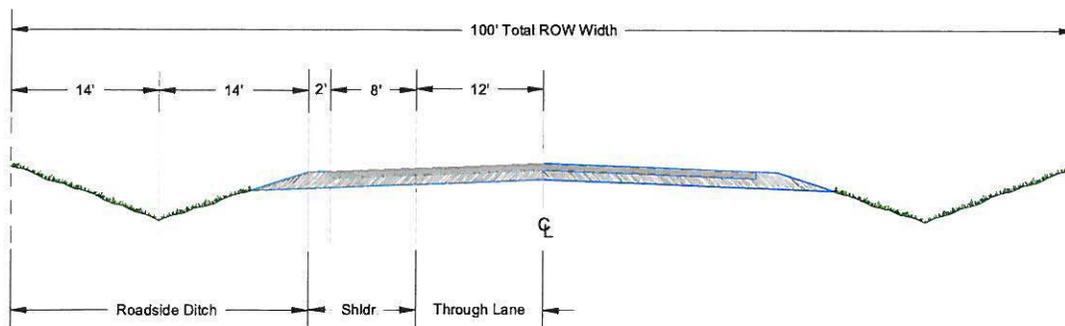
Typical Rural Principal Arterial Partial Cross-Section (4 Lane)
